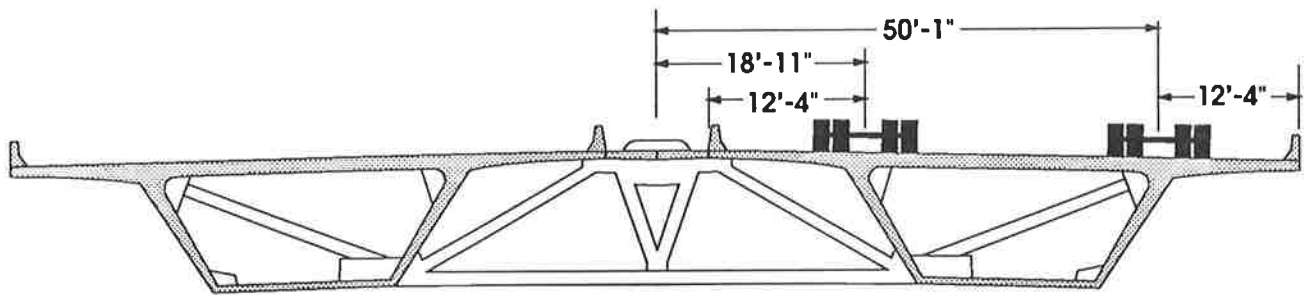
CROSS SECTION OF TWIN BOX GIRDER SHOWING TRANSVERSE LOCATIONS OF TEST VEHICLE
